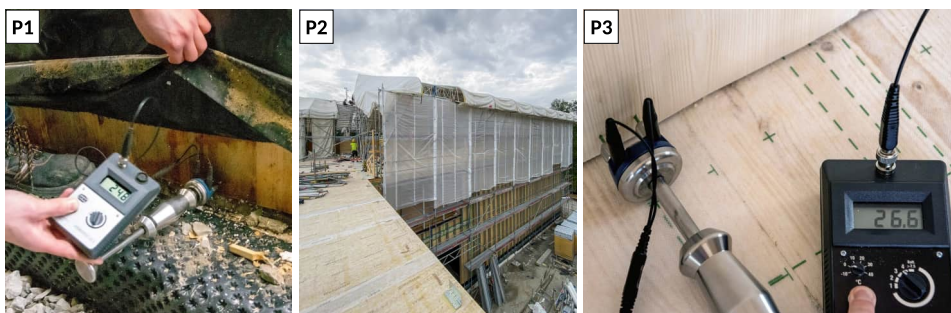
Photos taken during the field study. P1: Moisture measurements at the exterior wall to foundation connection in the building B about nine weeks after the installation of CLT. P2: Installation of the FWP structure at the construction site of the building G. P3: High MC in the bottom area of a wall panel on the 2nd floor of the building H.
